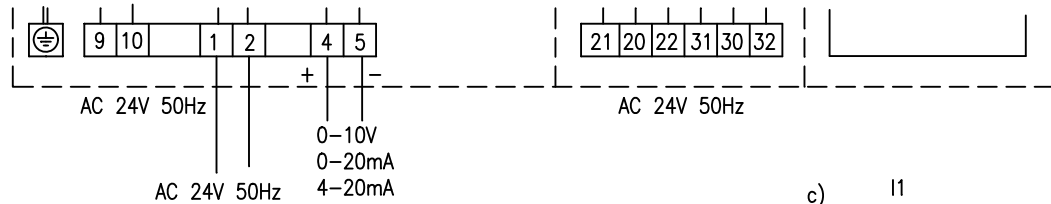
CONNECTION SCHEME AND DRAWING OF TERMINAL BOARD
